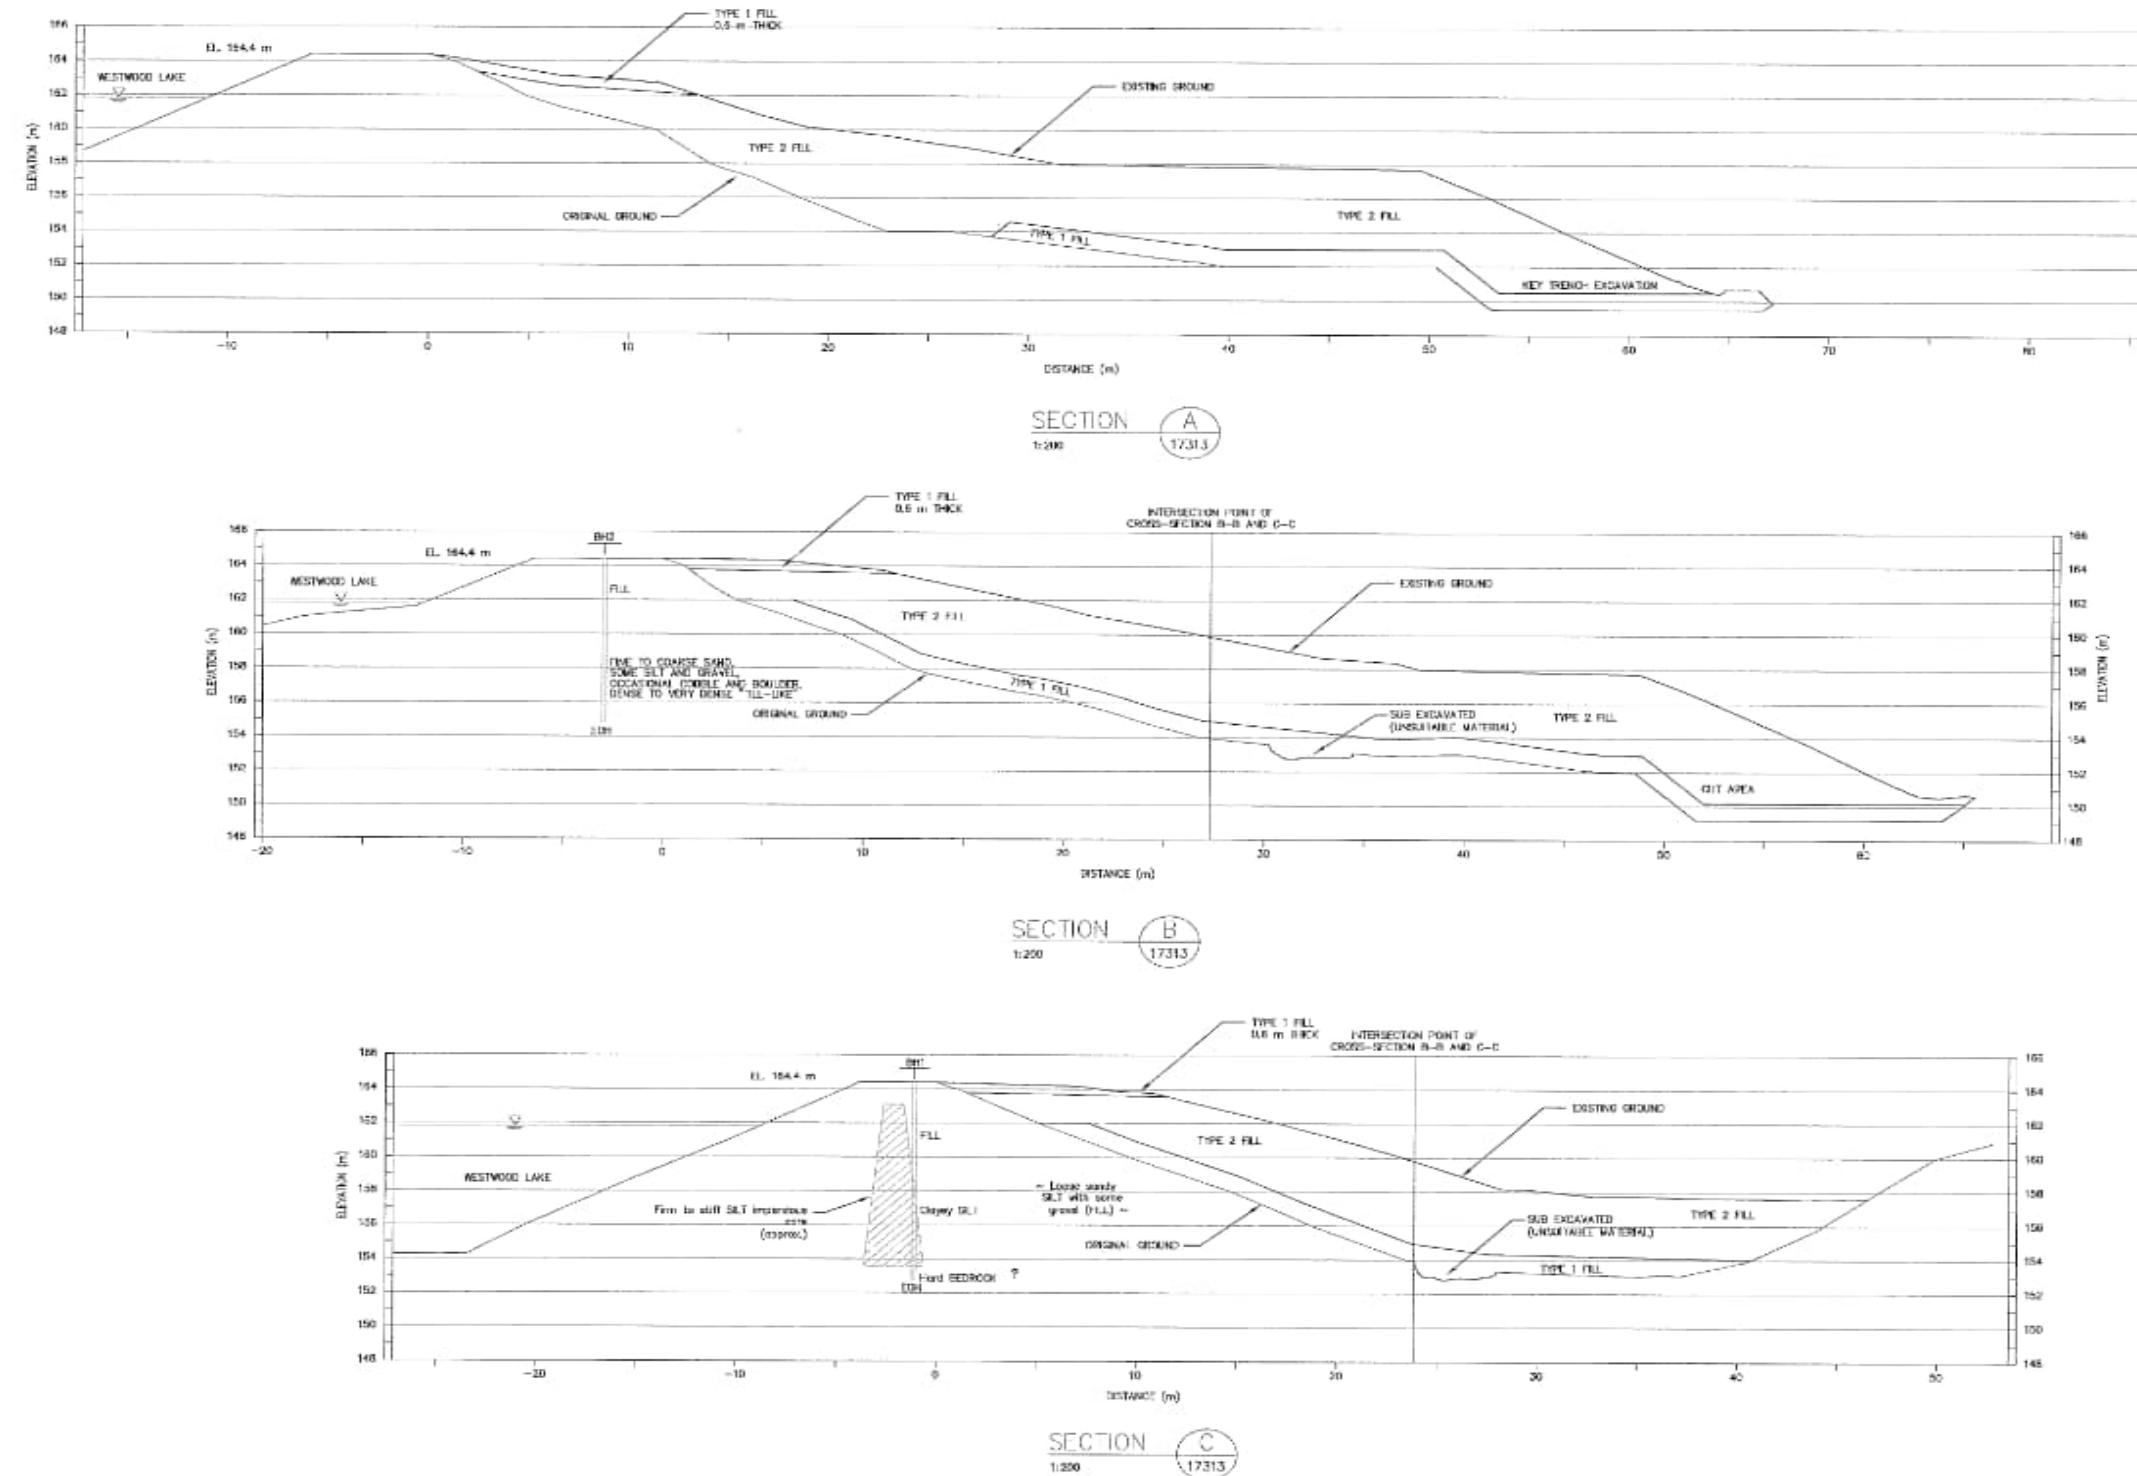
Cross Sections of Westwood Dam (Provided by The City)
